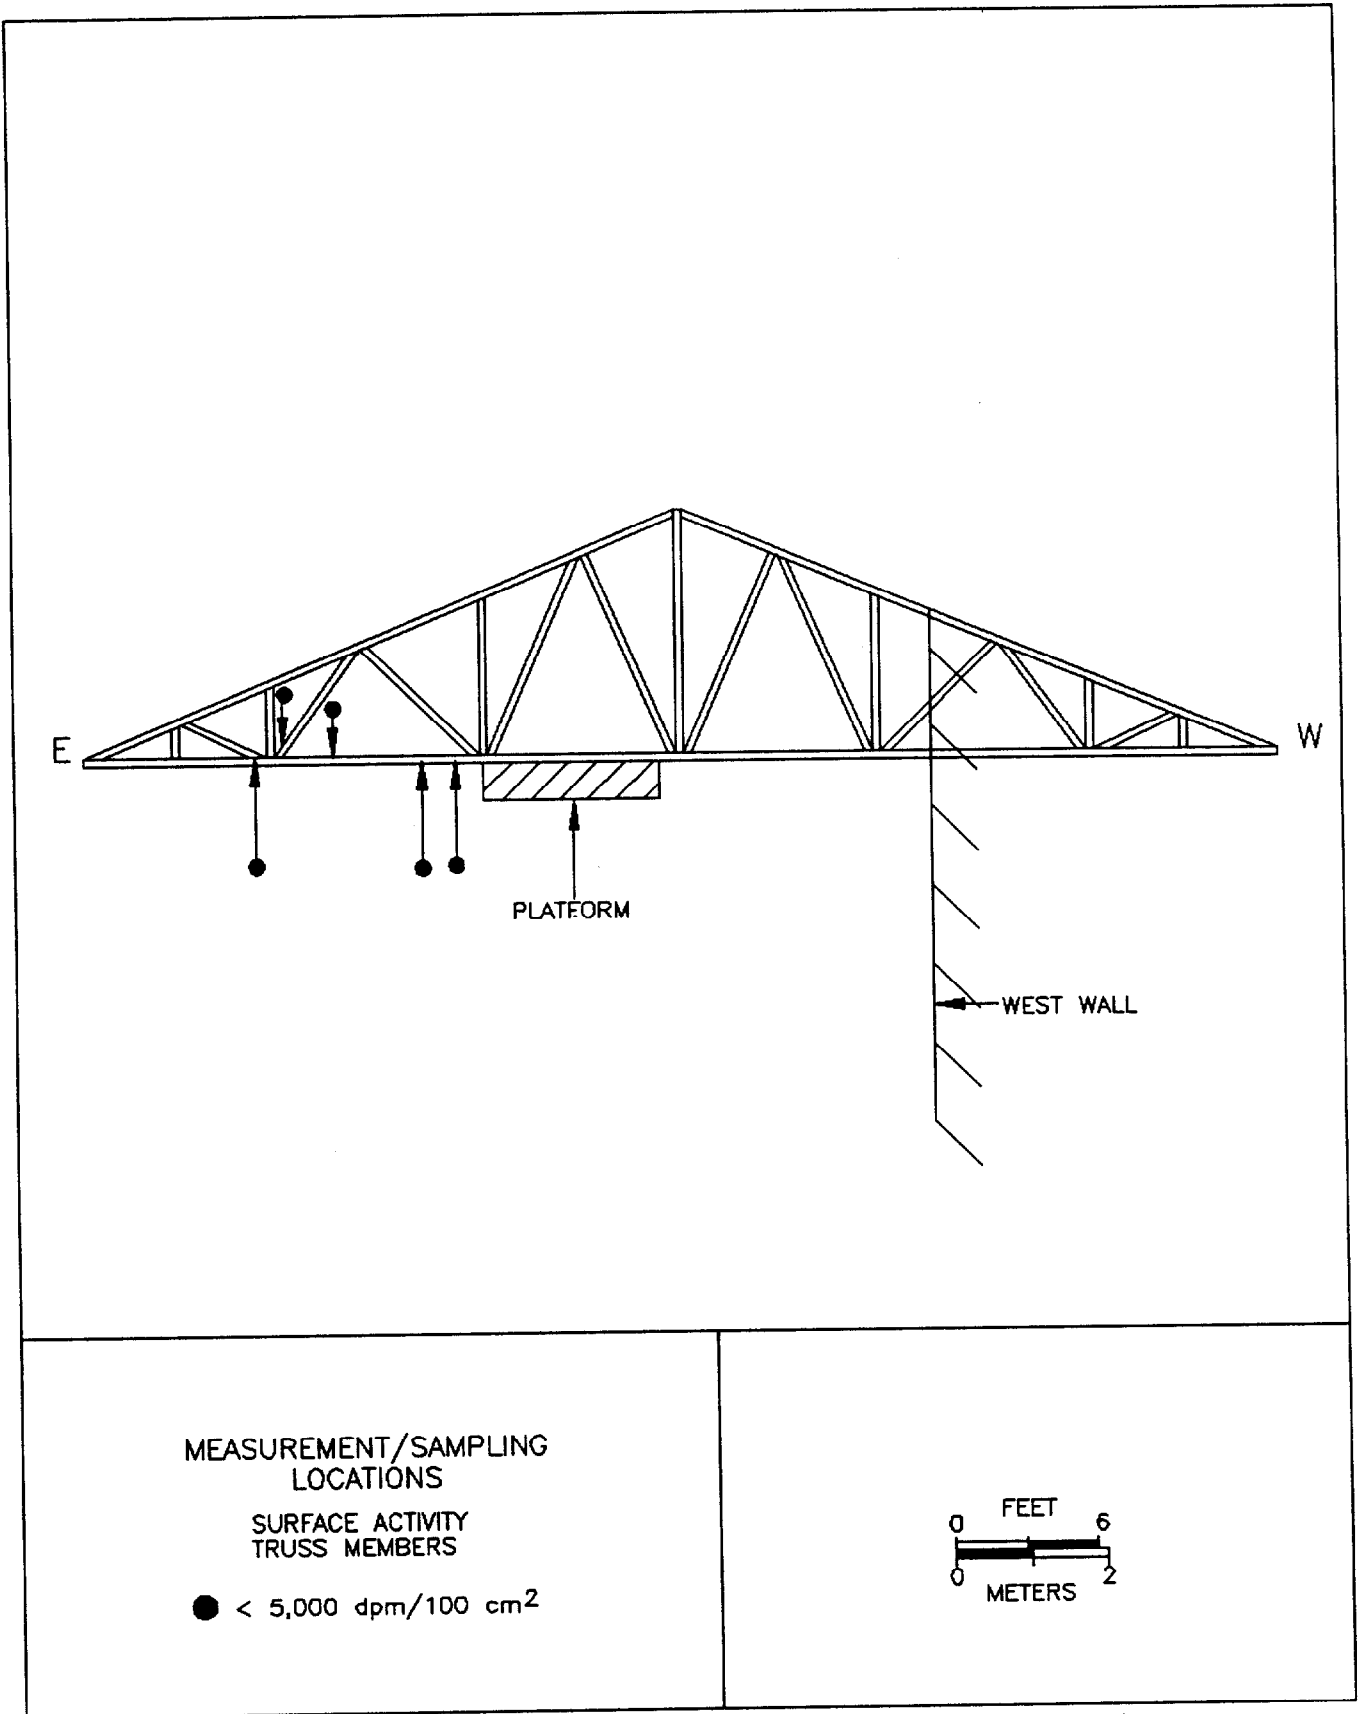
Building 8, Truss 5 – Measurement and Sampling Locations
